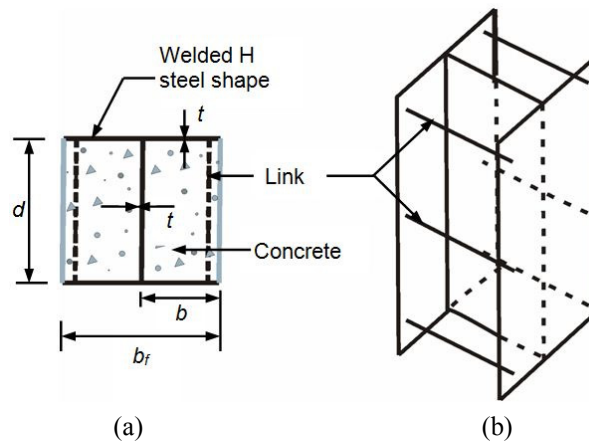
Partially encased composite column with thin-walled built-up steel section: (a) column cross-section; and (b) 3d view of the steel configuration
